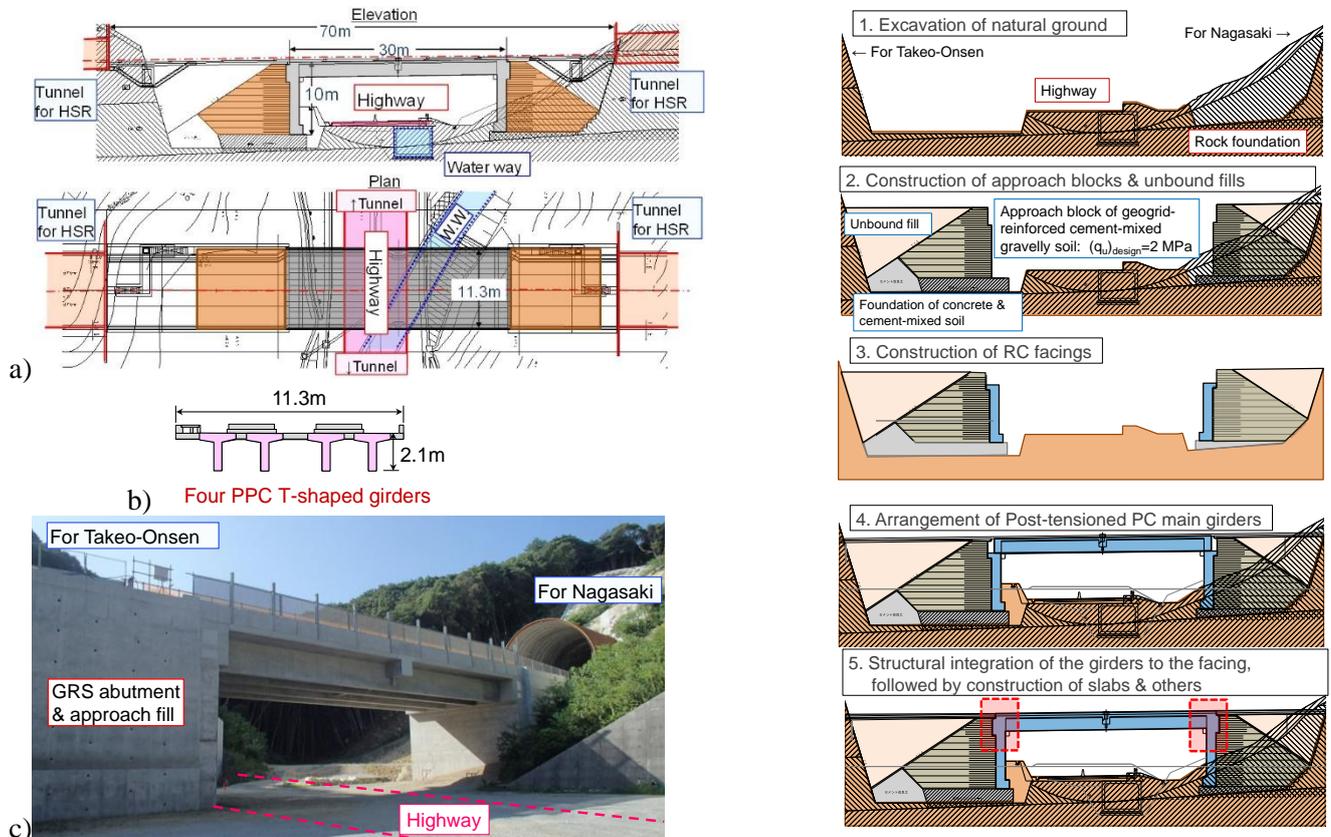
GRS integral bridge at Genshu: a) structure; b) PPC girders; c) completed bridge; and d) construction.
